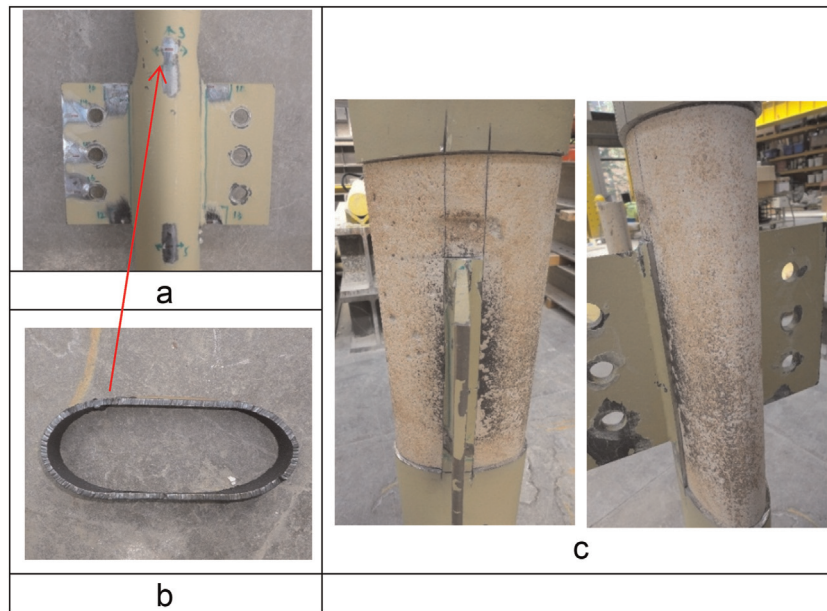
Failure of Type-C connections: (a) Joint-C; (b) top cross-section of Joint-C column and (c) core concrete of Joint-CC.
